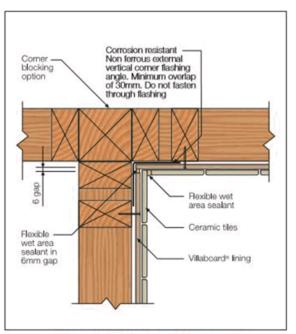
VERTICAL CORNER FLASHING FOR EXTERNAL MEMBRANE - SHOWER RECESS
